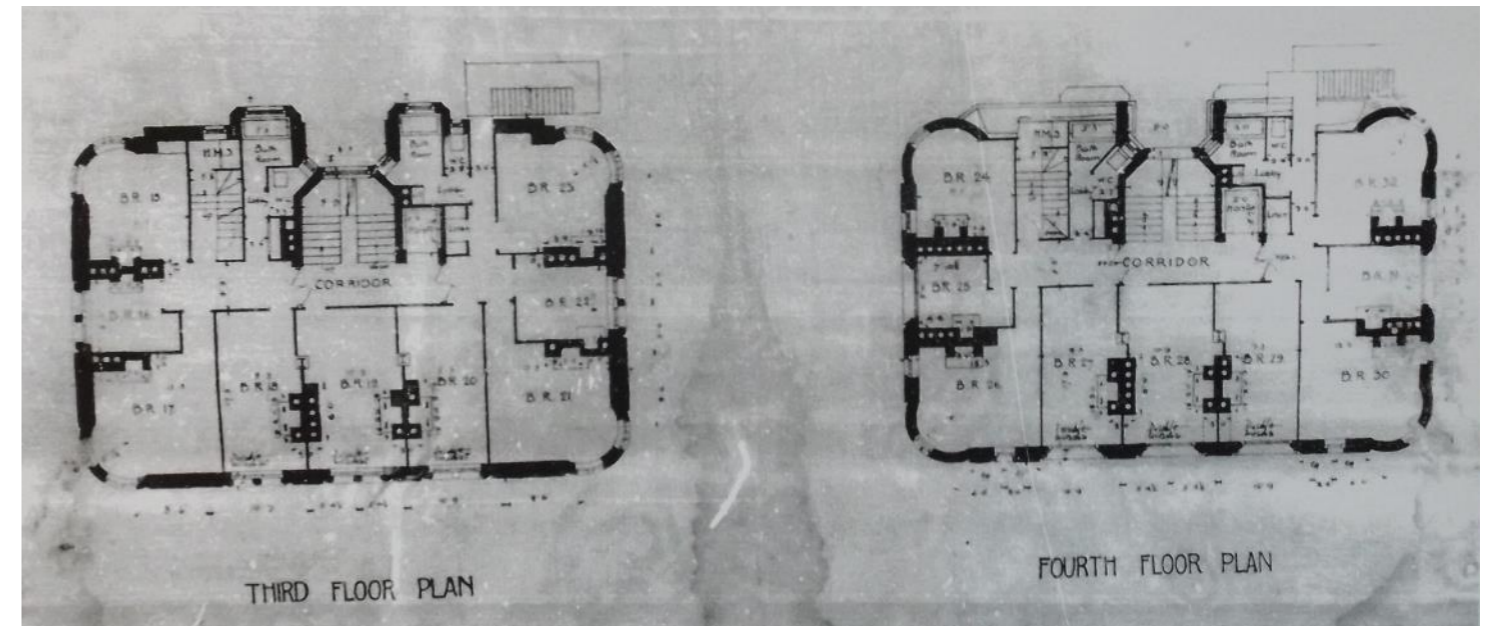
Third and Fourth Floor Drainage plans of the newly constructed building (1905)
